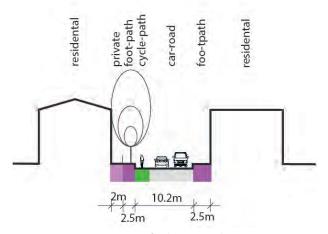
Section B-B: Cranford Street widening as proposed.
